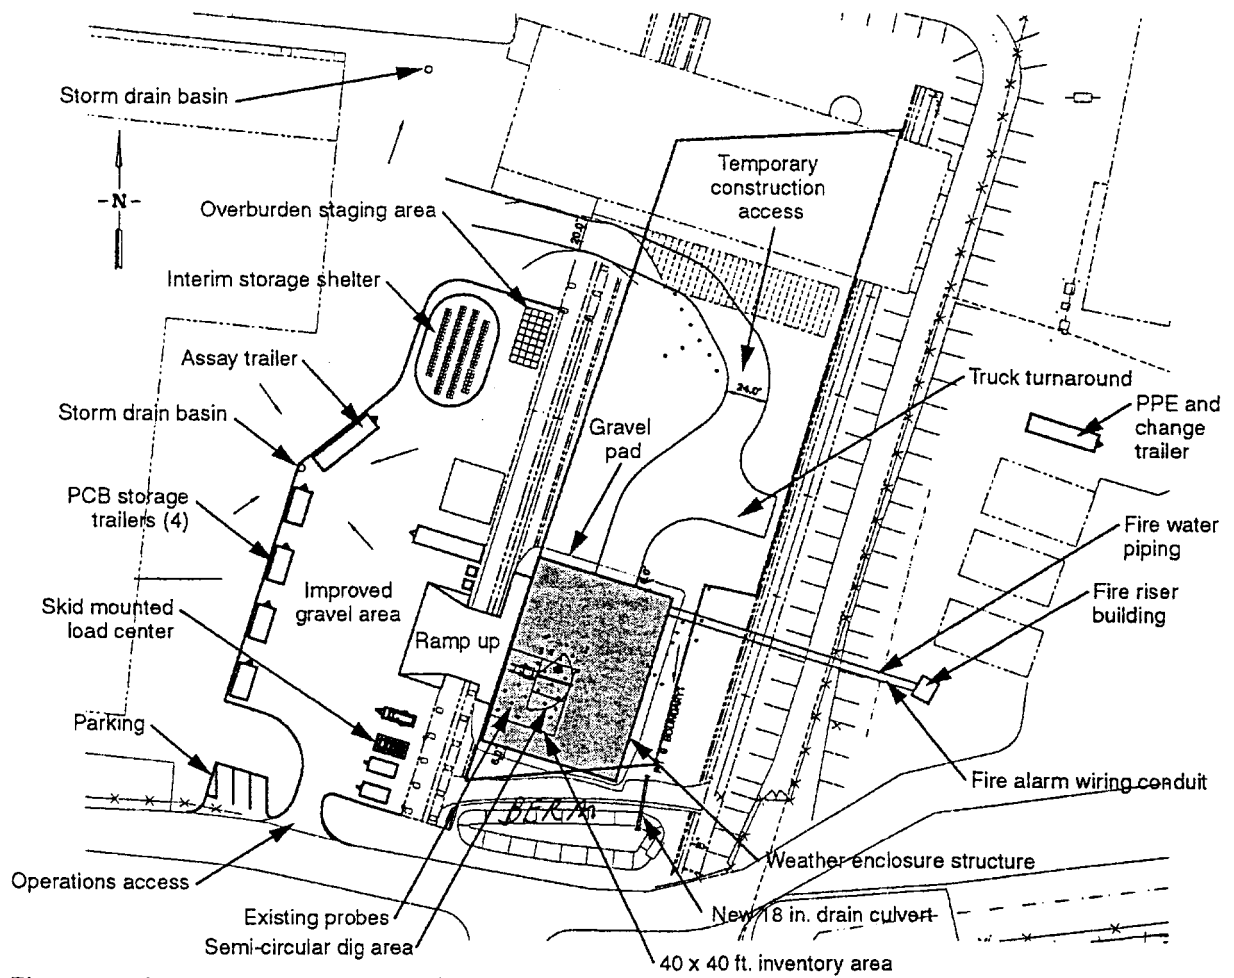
Site Layout Located at Pit 9 in the RWMC SDA
